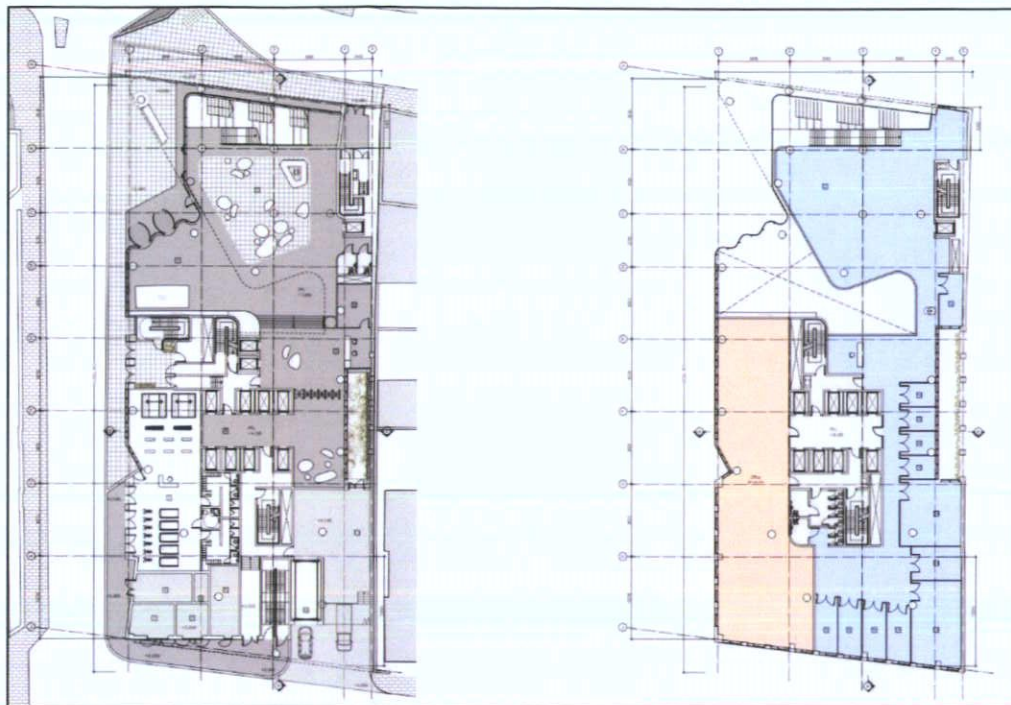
Ground Floor and First Floor Plan (Mahoney Architecture 2022)
